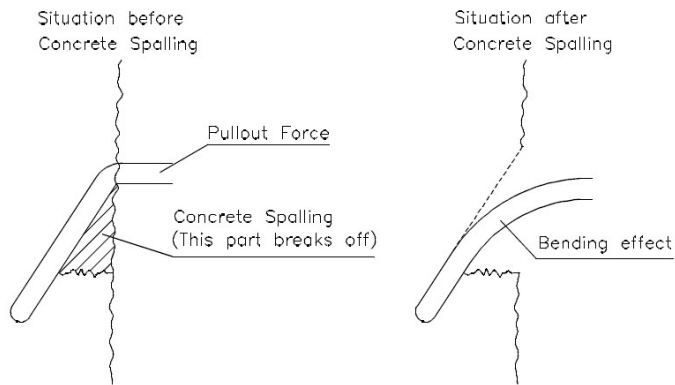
Concrete spalling (Dupont, 2003)
